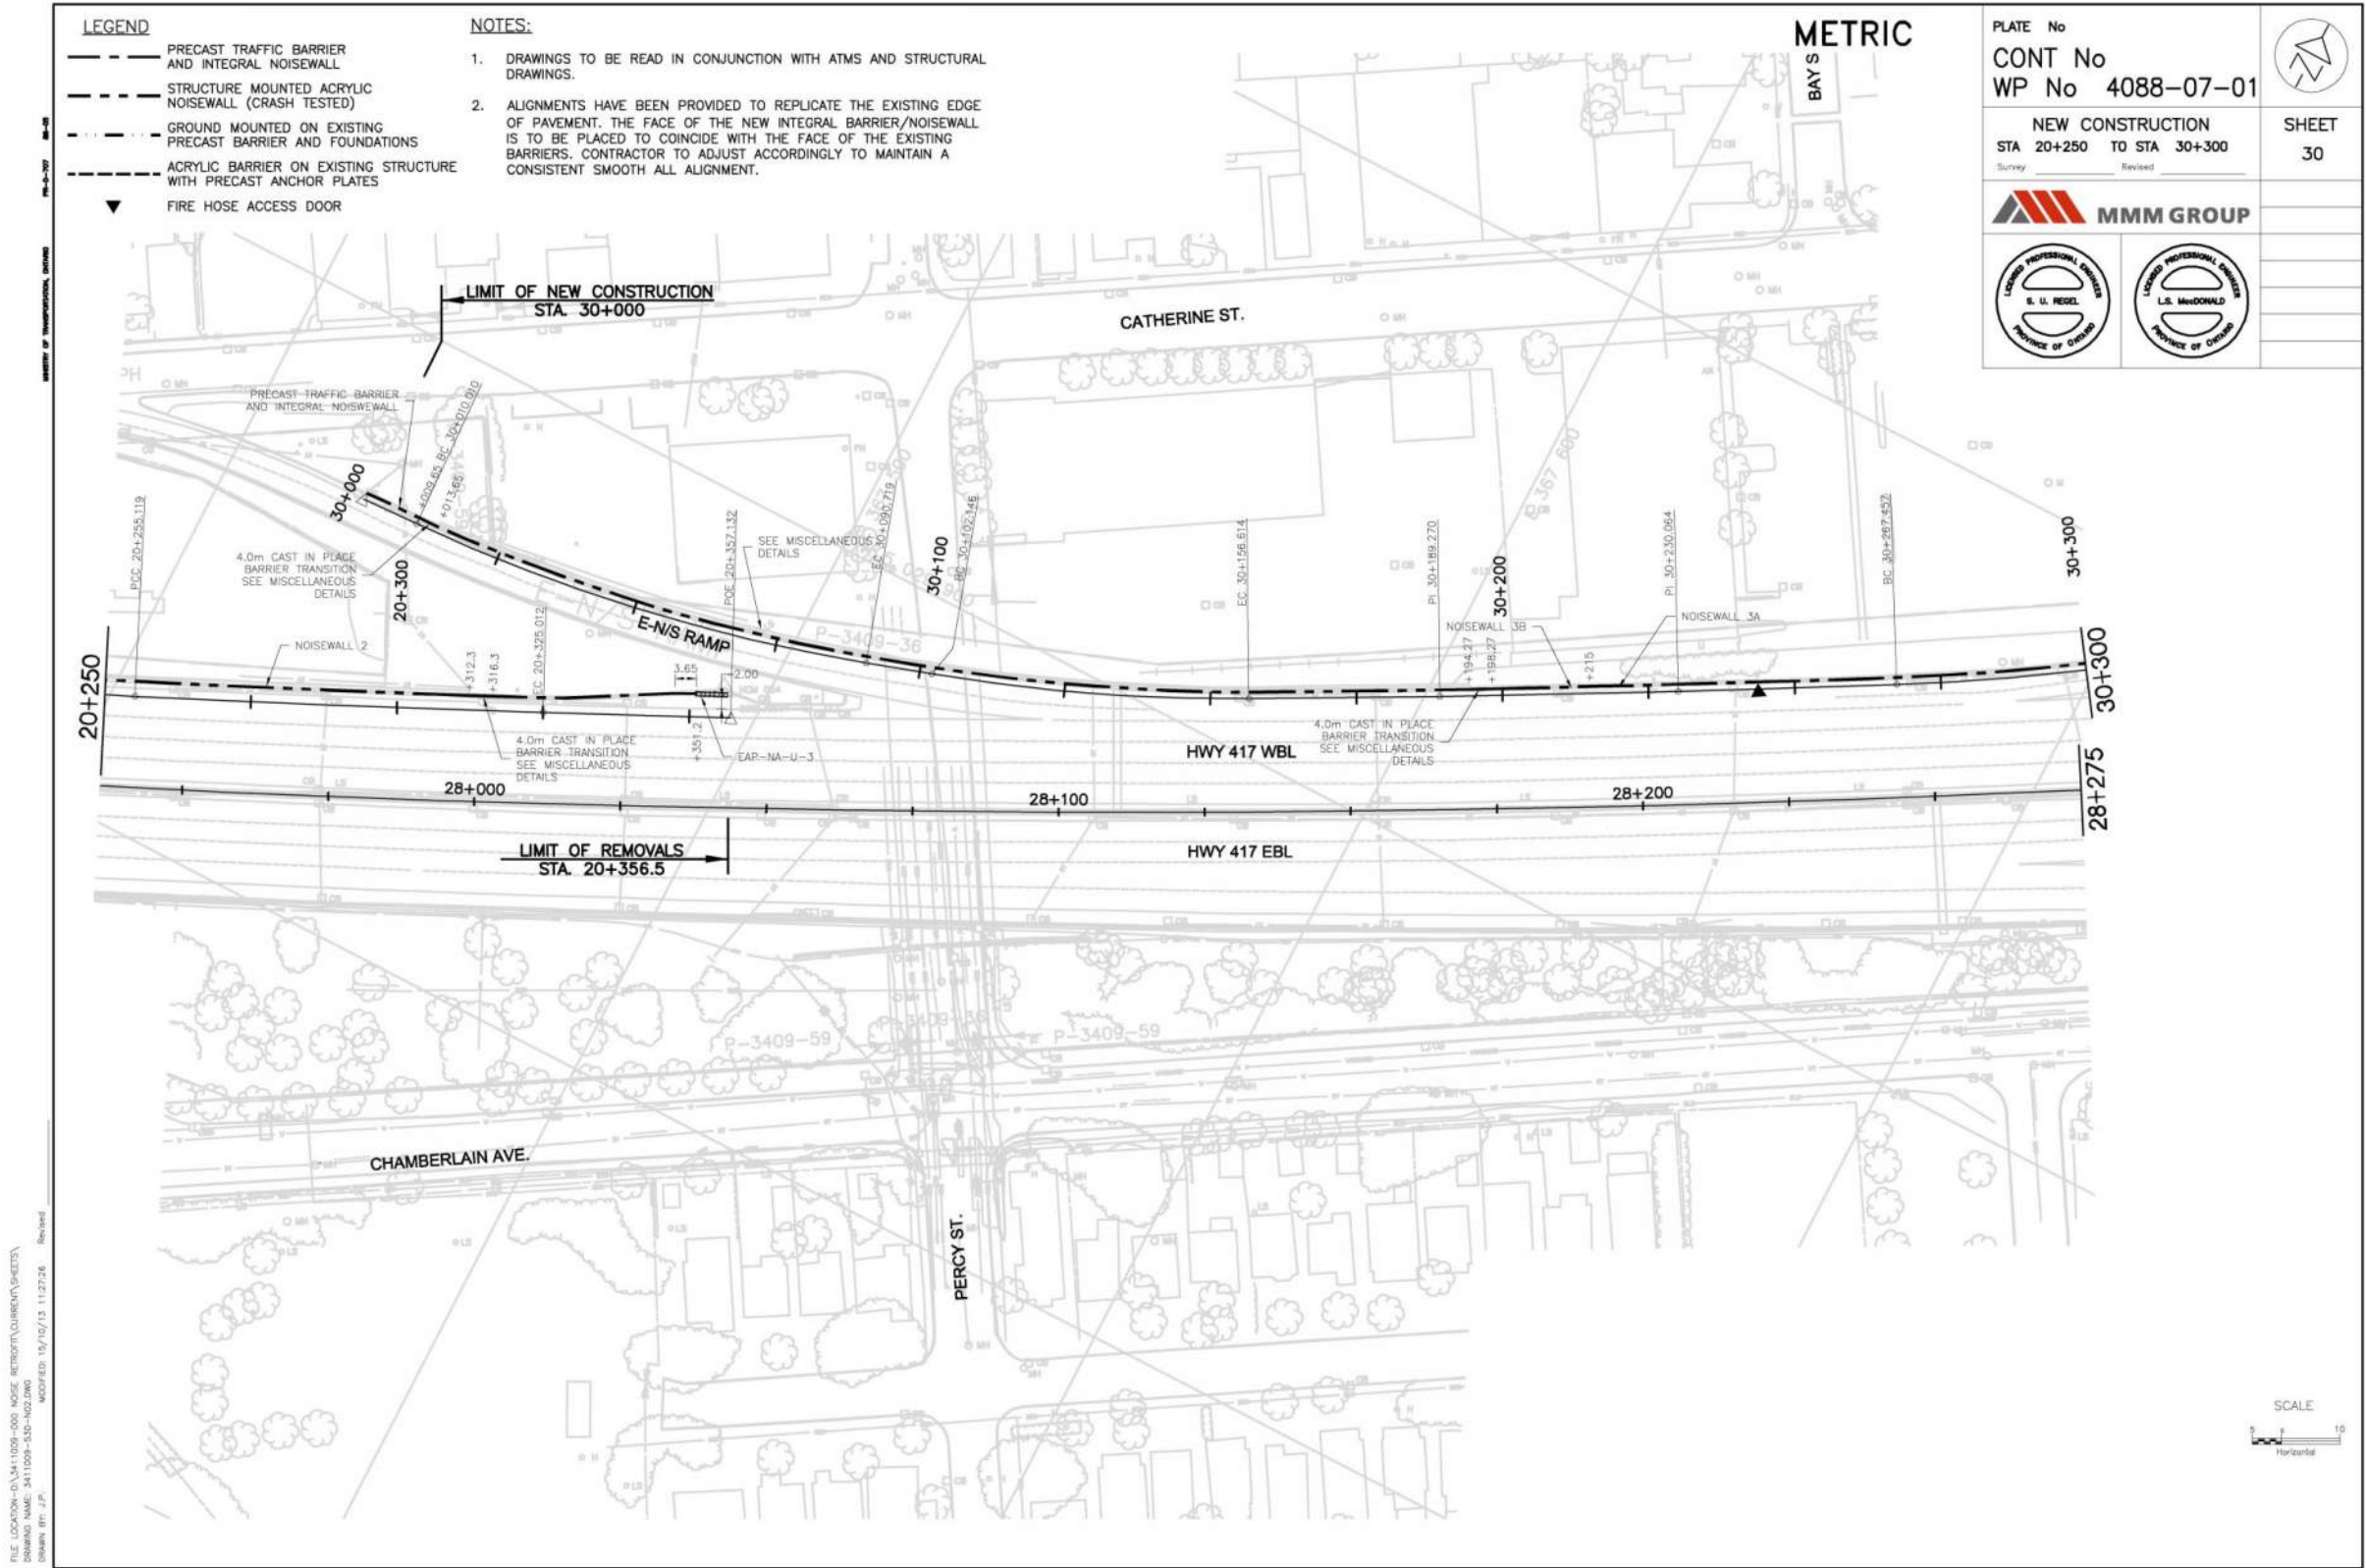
Highway 417 Noise Barrier Retrofits Recommended Plan – Noise Walls 3A, 3C and 4
